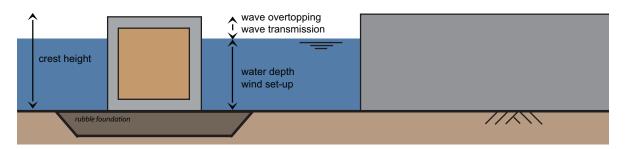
Cross-sectional View (left) and Side View (right) of Caisson Breakwater
